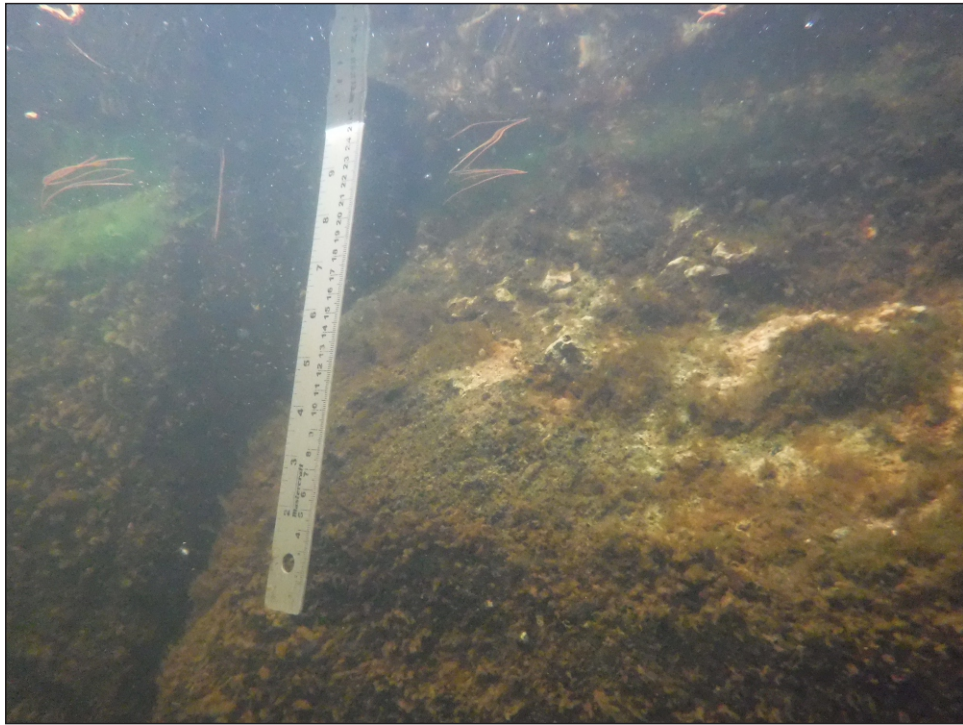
Spall at waterline, west side of Rest Pier
